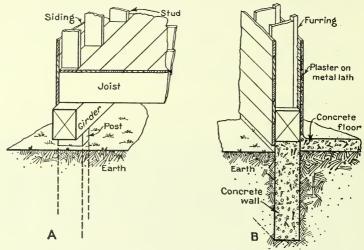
A, Detail of old barn with floor supported a few inches above ground on girders and posts; B, same barn made rat proof with concrete foundation and floors and cement-plastered walls
